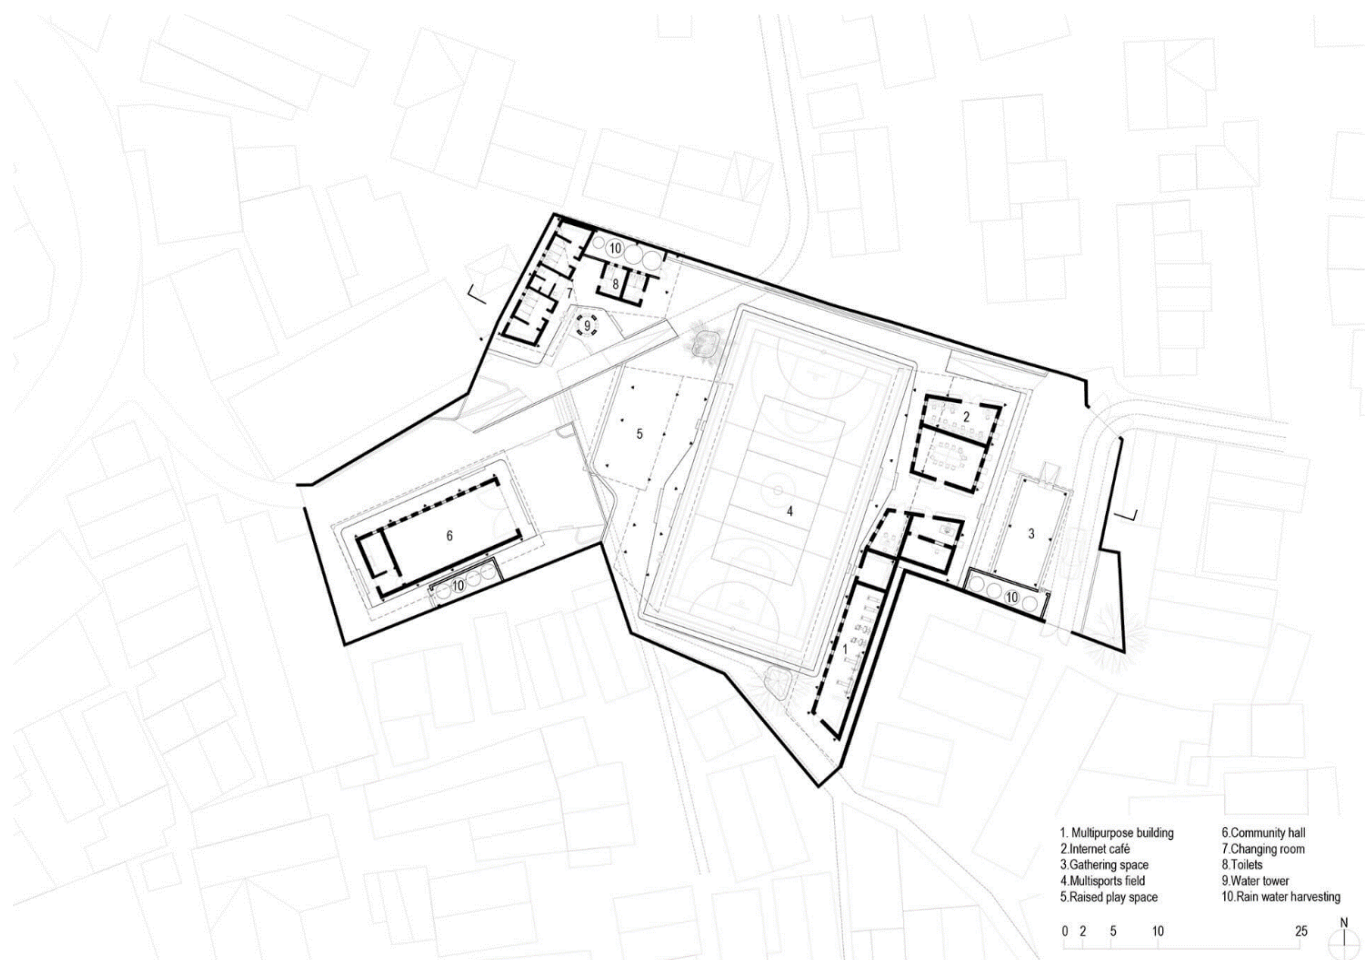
Site plan depicting how it conforms to the arrangement of spaces and surroundings
